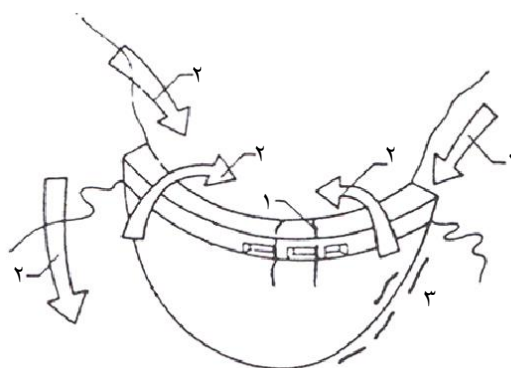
Failure mechanisms of arch concrete dam (Rezaiee-Pajand et al., 2021)
